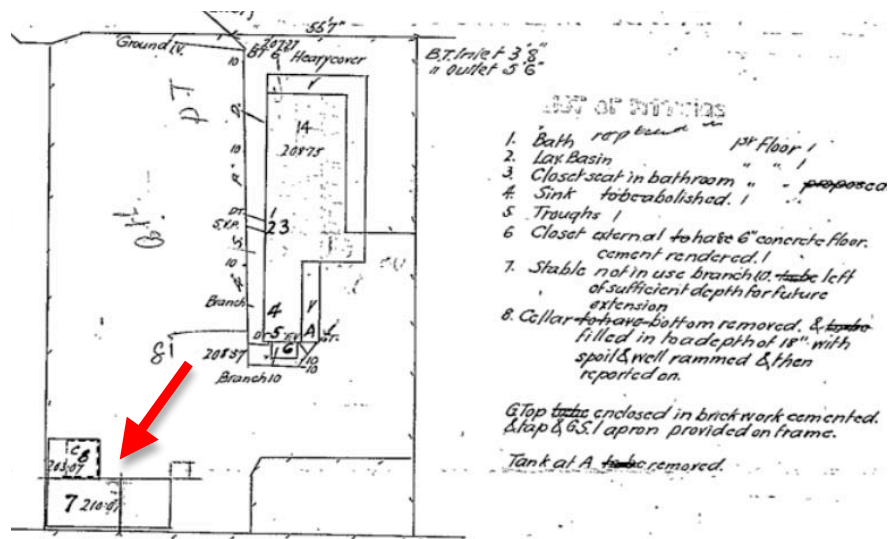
A 1912 MMBW Plan of drainage for the house presently numbered 16 Sorrett Avenue. The stables are in the bottom left corner of the plan (labelled '7'). Source: Yarra Valley Water.
